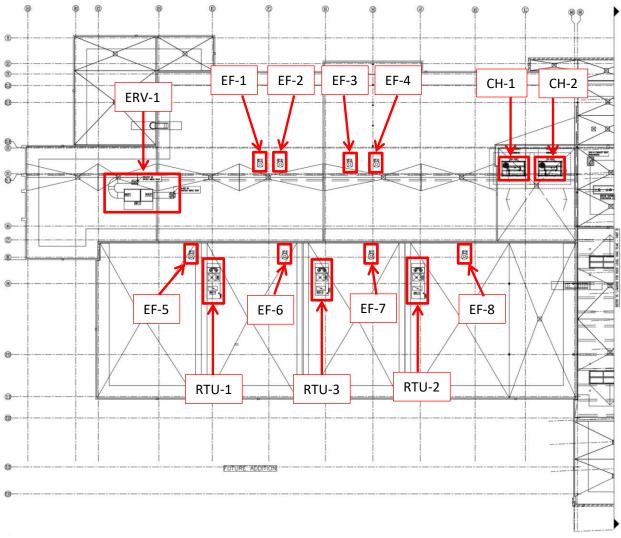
Rooftop mechanical plan (West side) showing locations of considered equipment.
